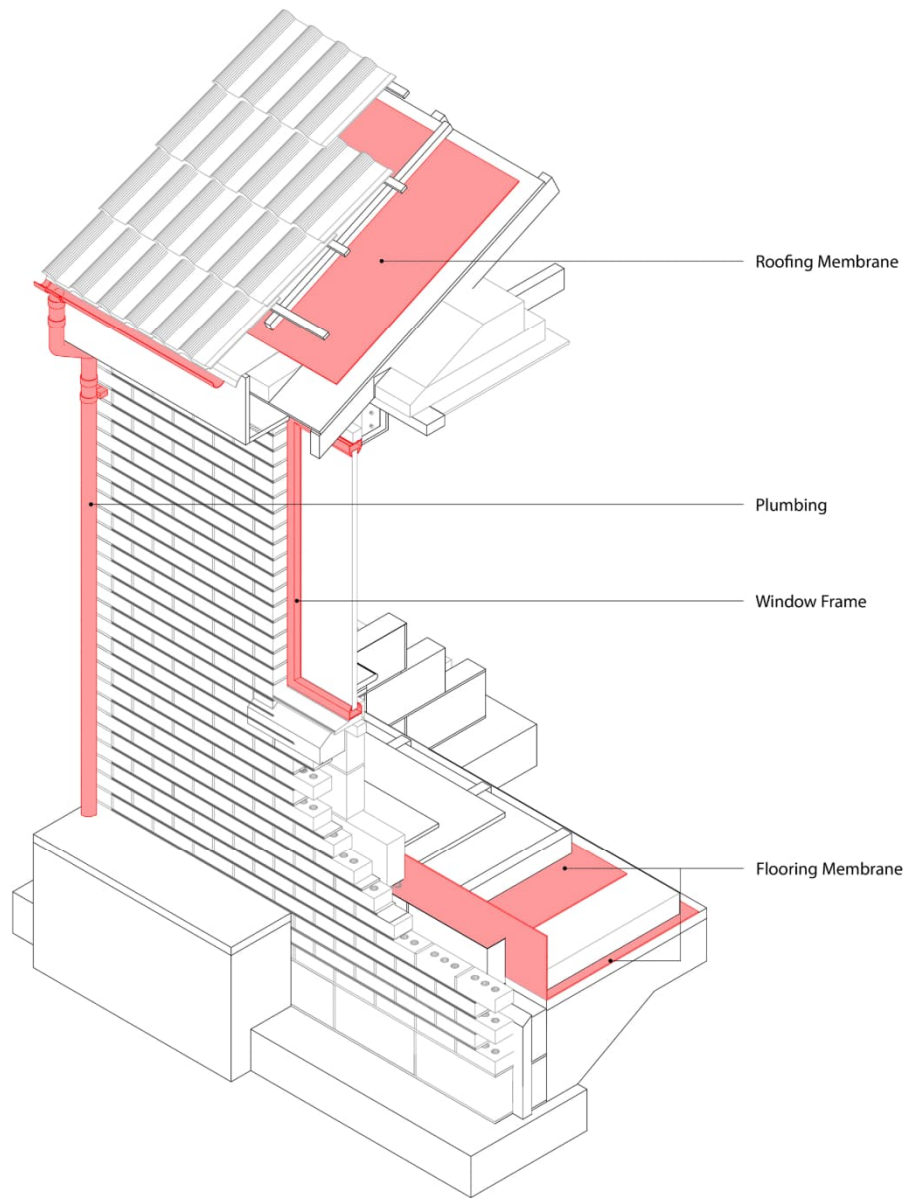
Jiayi and Ducharme, Olivier; Plastic in Masonry Wood Construction. Student Drawing, 2019.
